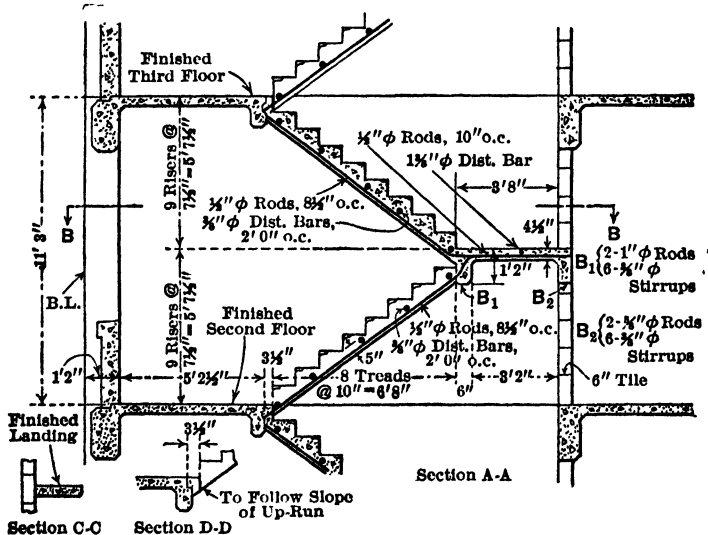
Structural Design of Reinforced-Concrete Stairs. Section
